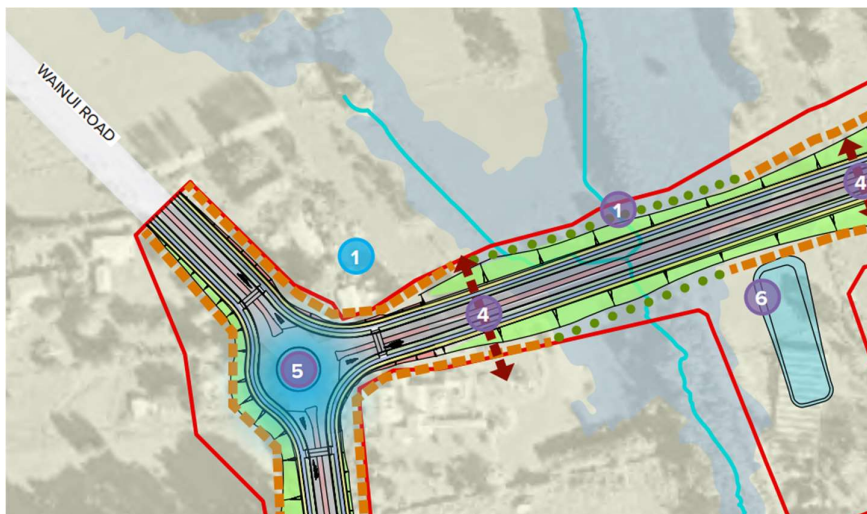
Intersection at Wainui Road with Upper Orewa Road, showing possible interface with school (from UDE).
